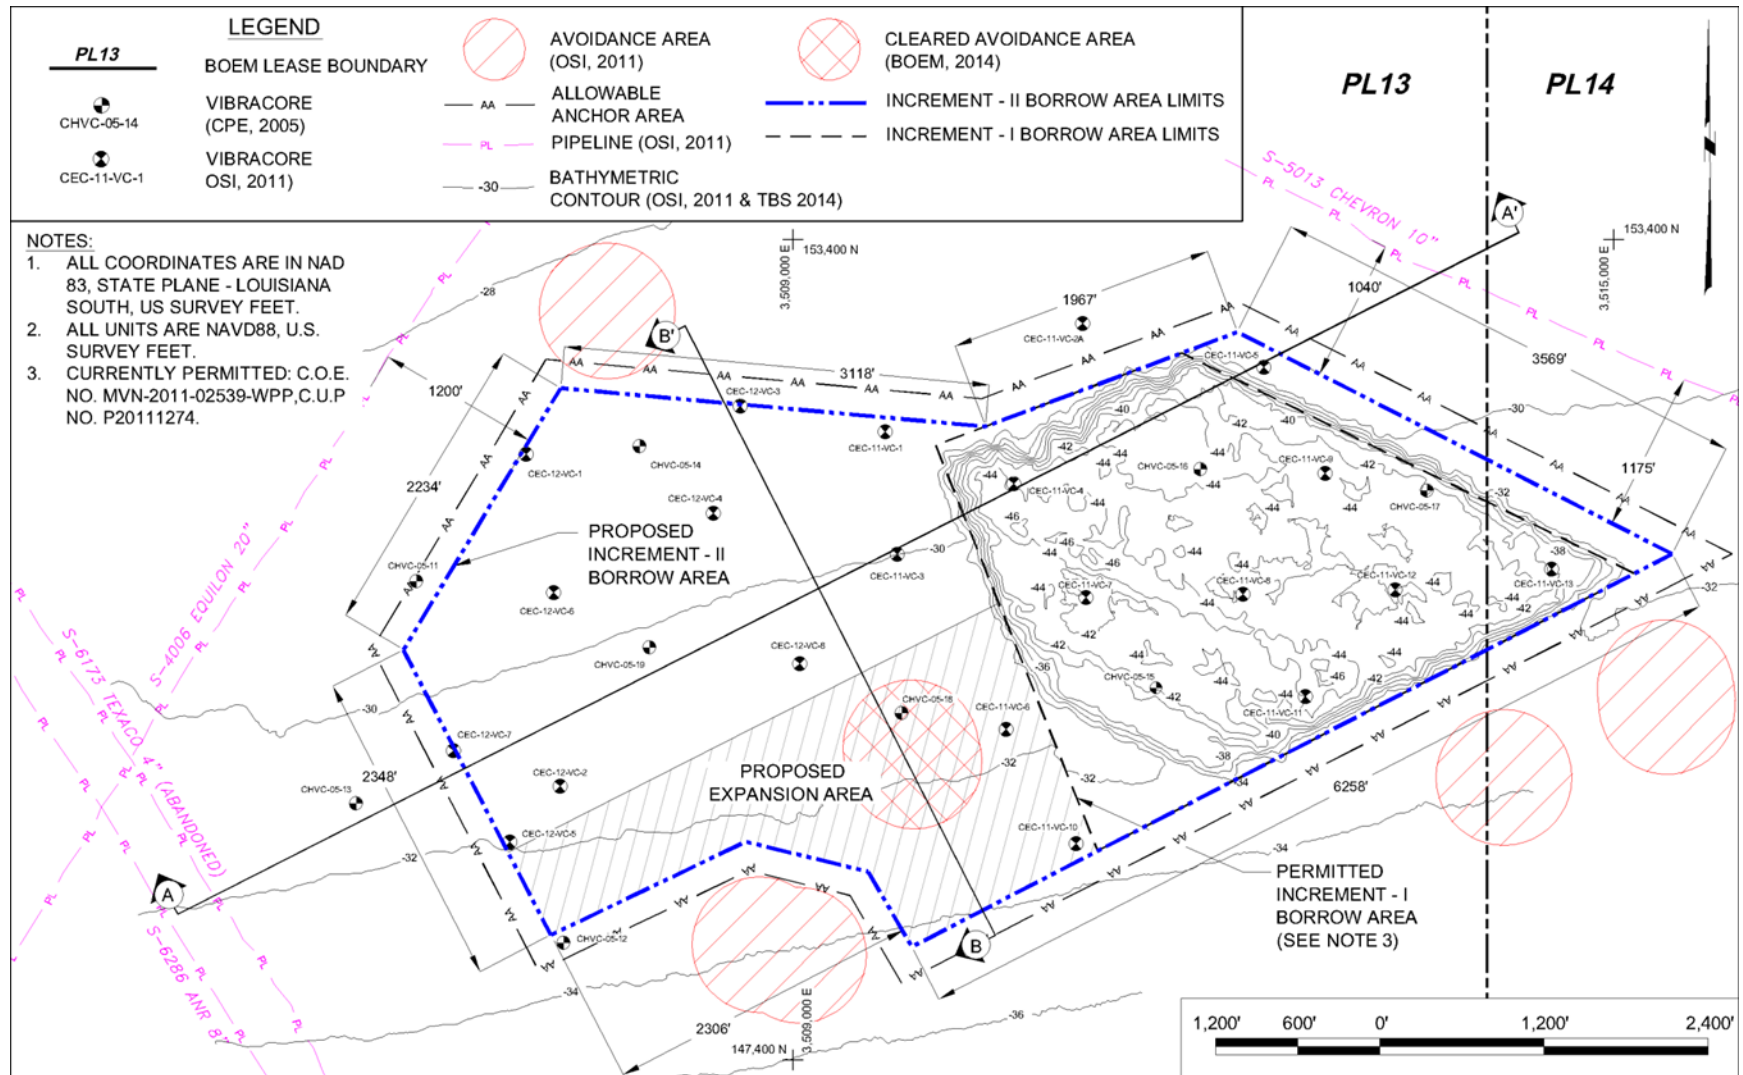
South Pelto Borrow Area Design Plan View - Expansion
